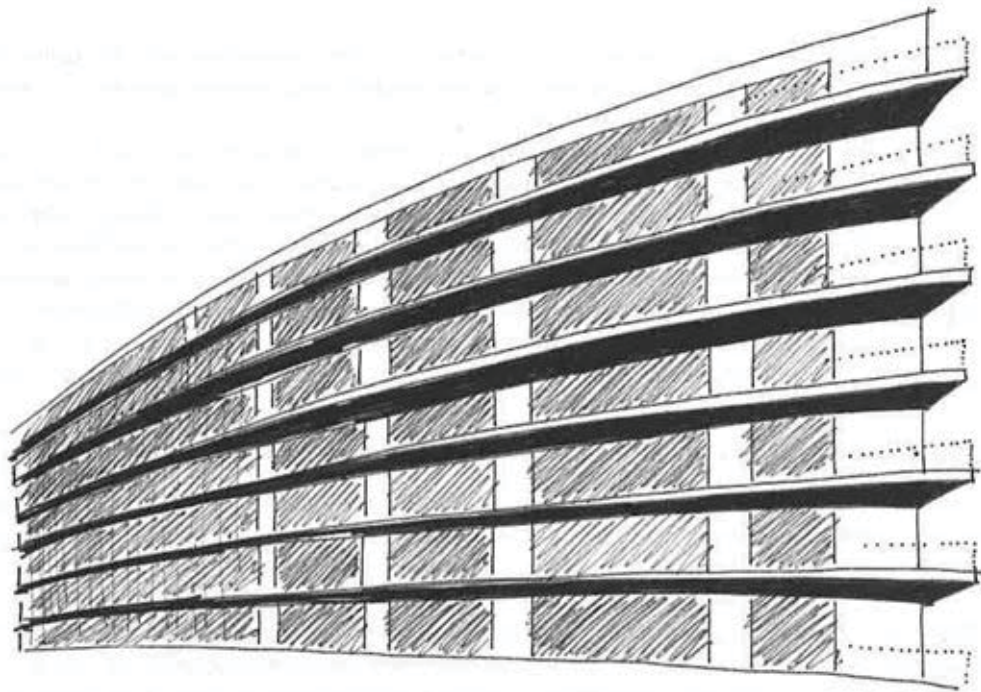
Low Energy Apartment Building, Berlin, south view.
